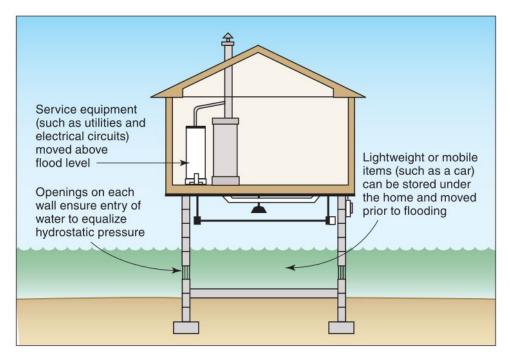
Example cross section of an elevated home using continuous foundation walls (FEMA, 2014)
